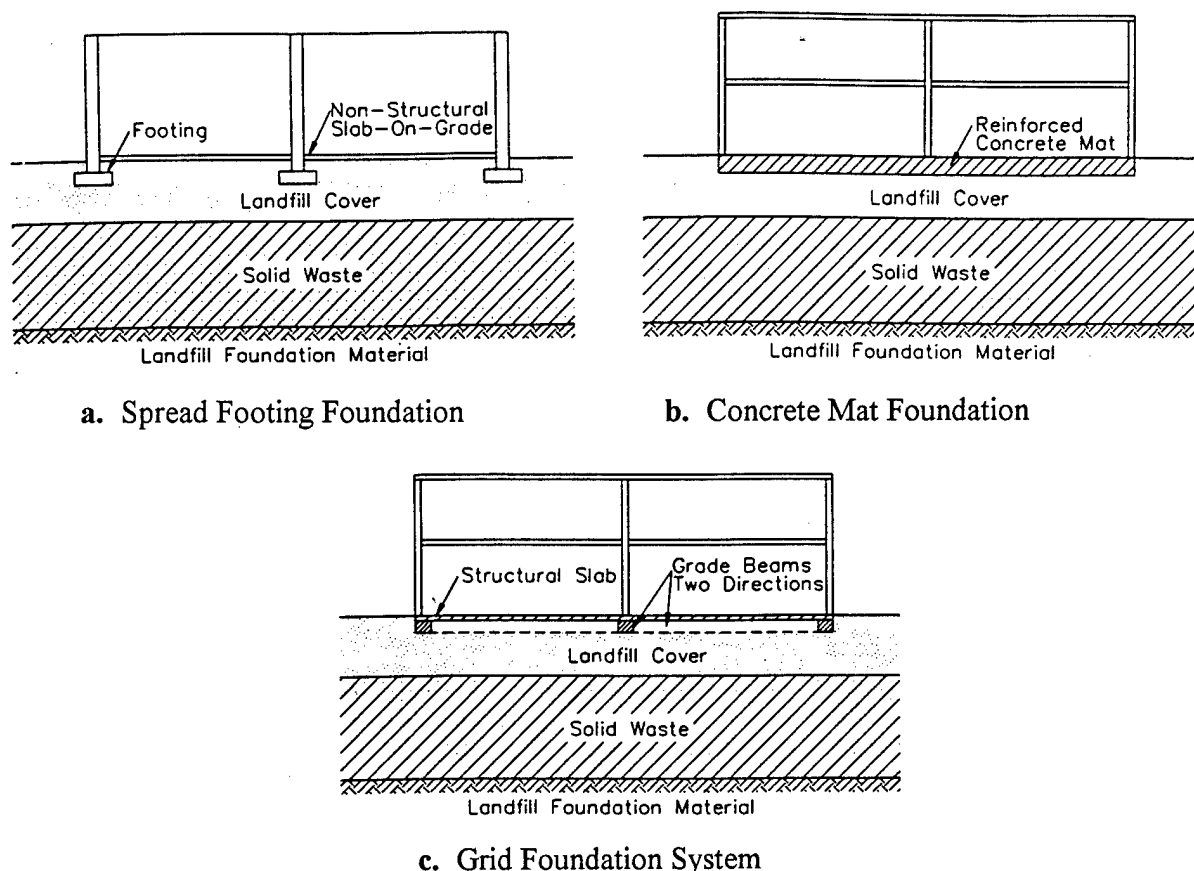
Shallow Foundation Types (Source: 37, p.147, Fig. 2)
